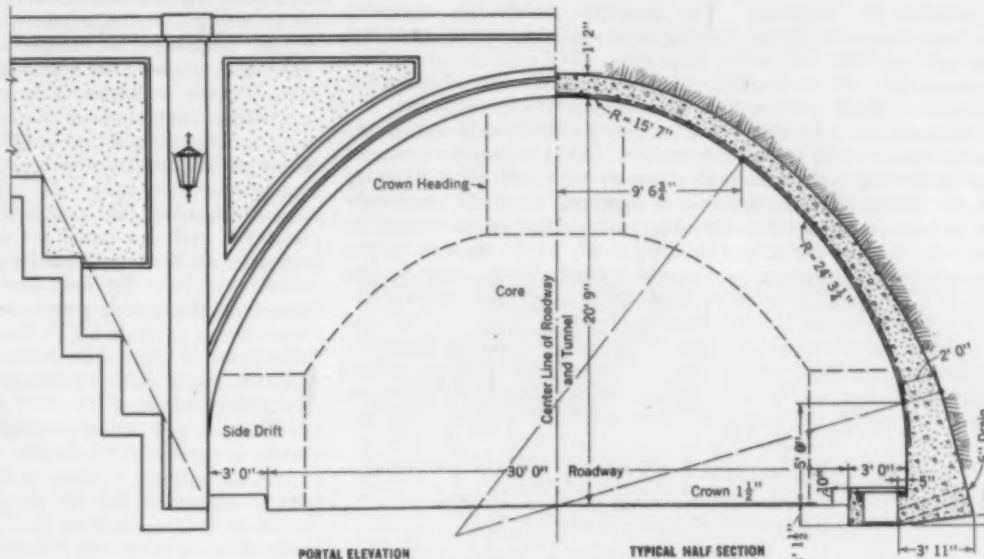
CROSS SECTION OF THE NEWCASTLE TUNNEL
